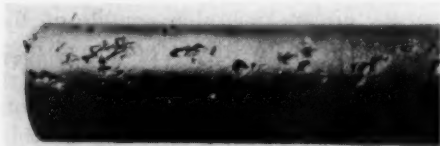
6-in. Steel Pipe Pitted by Anaerobic Corrosion During Eight Years Burial in Soil—Specimen Provided by R. F. Hadley.
